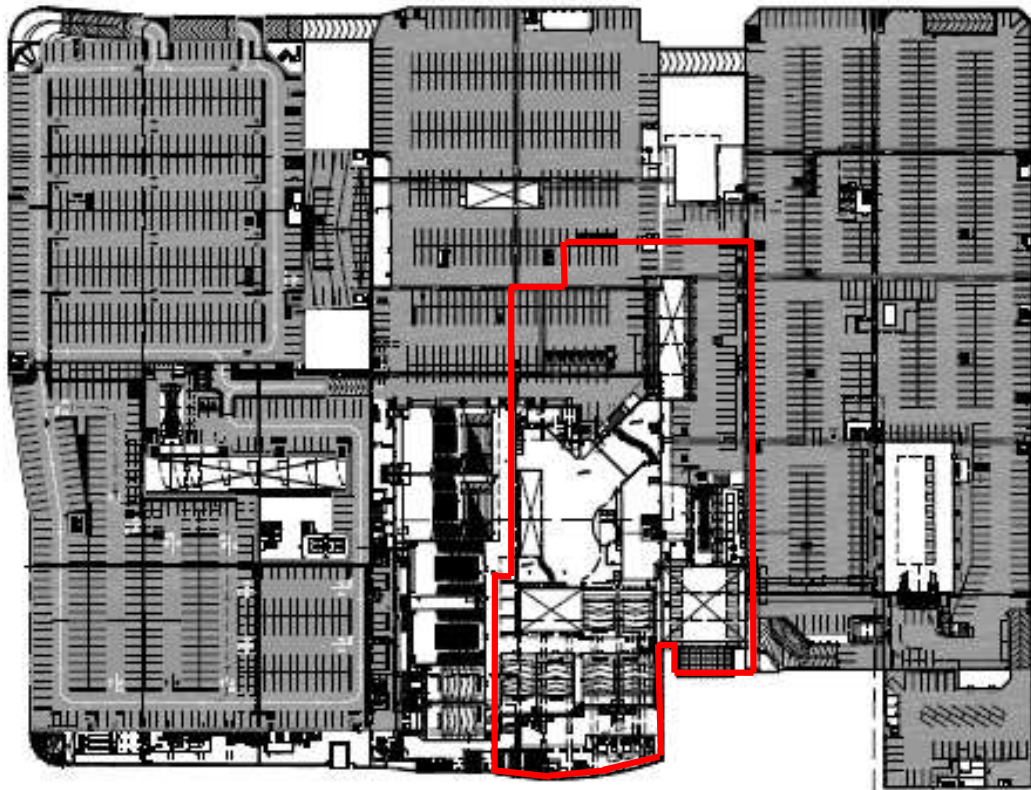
Existing Retail Level 3 Plan showing the existing floor layout and approximate indicative location of the proposed new ELP construction
